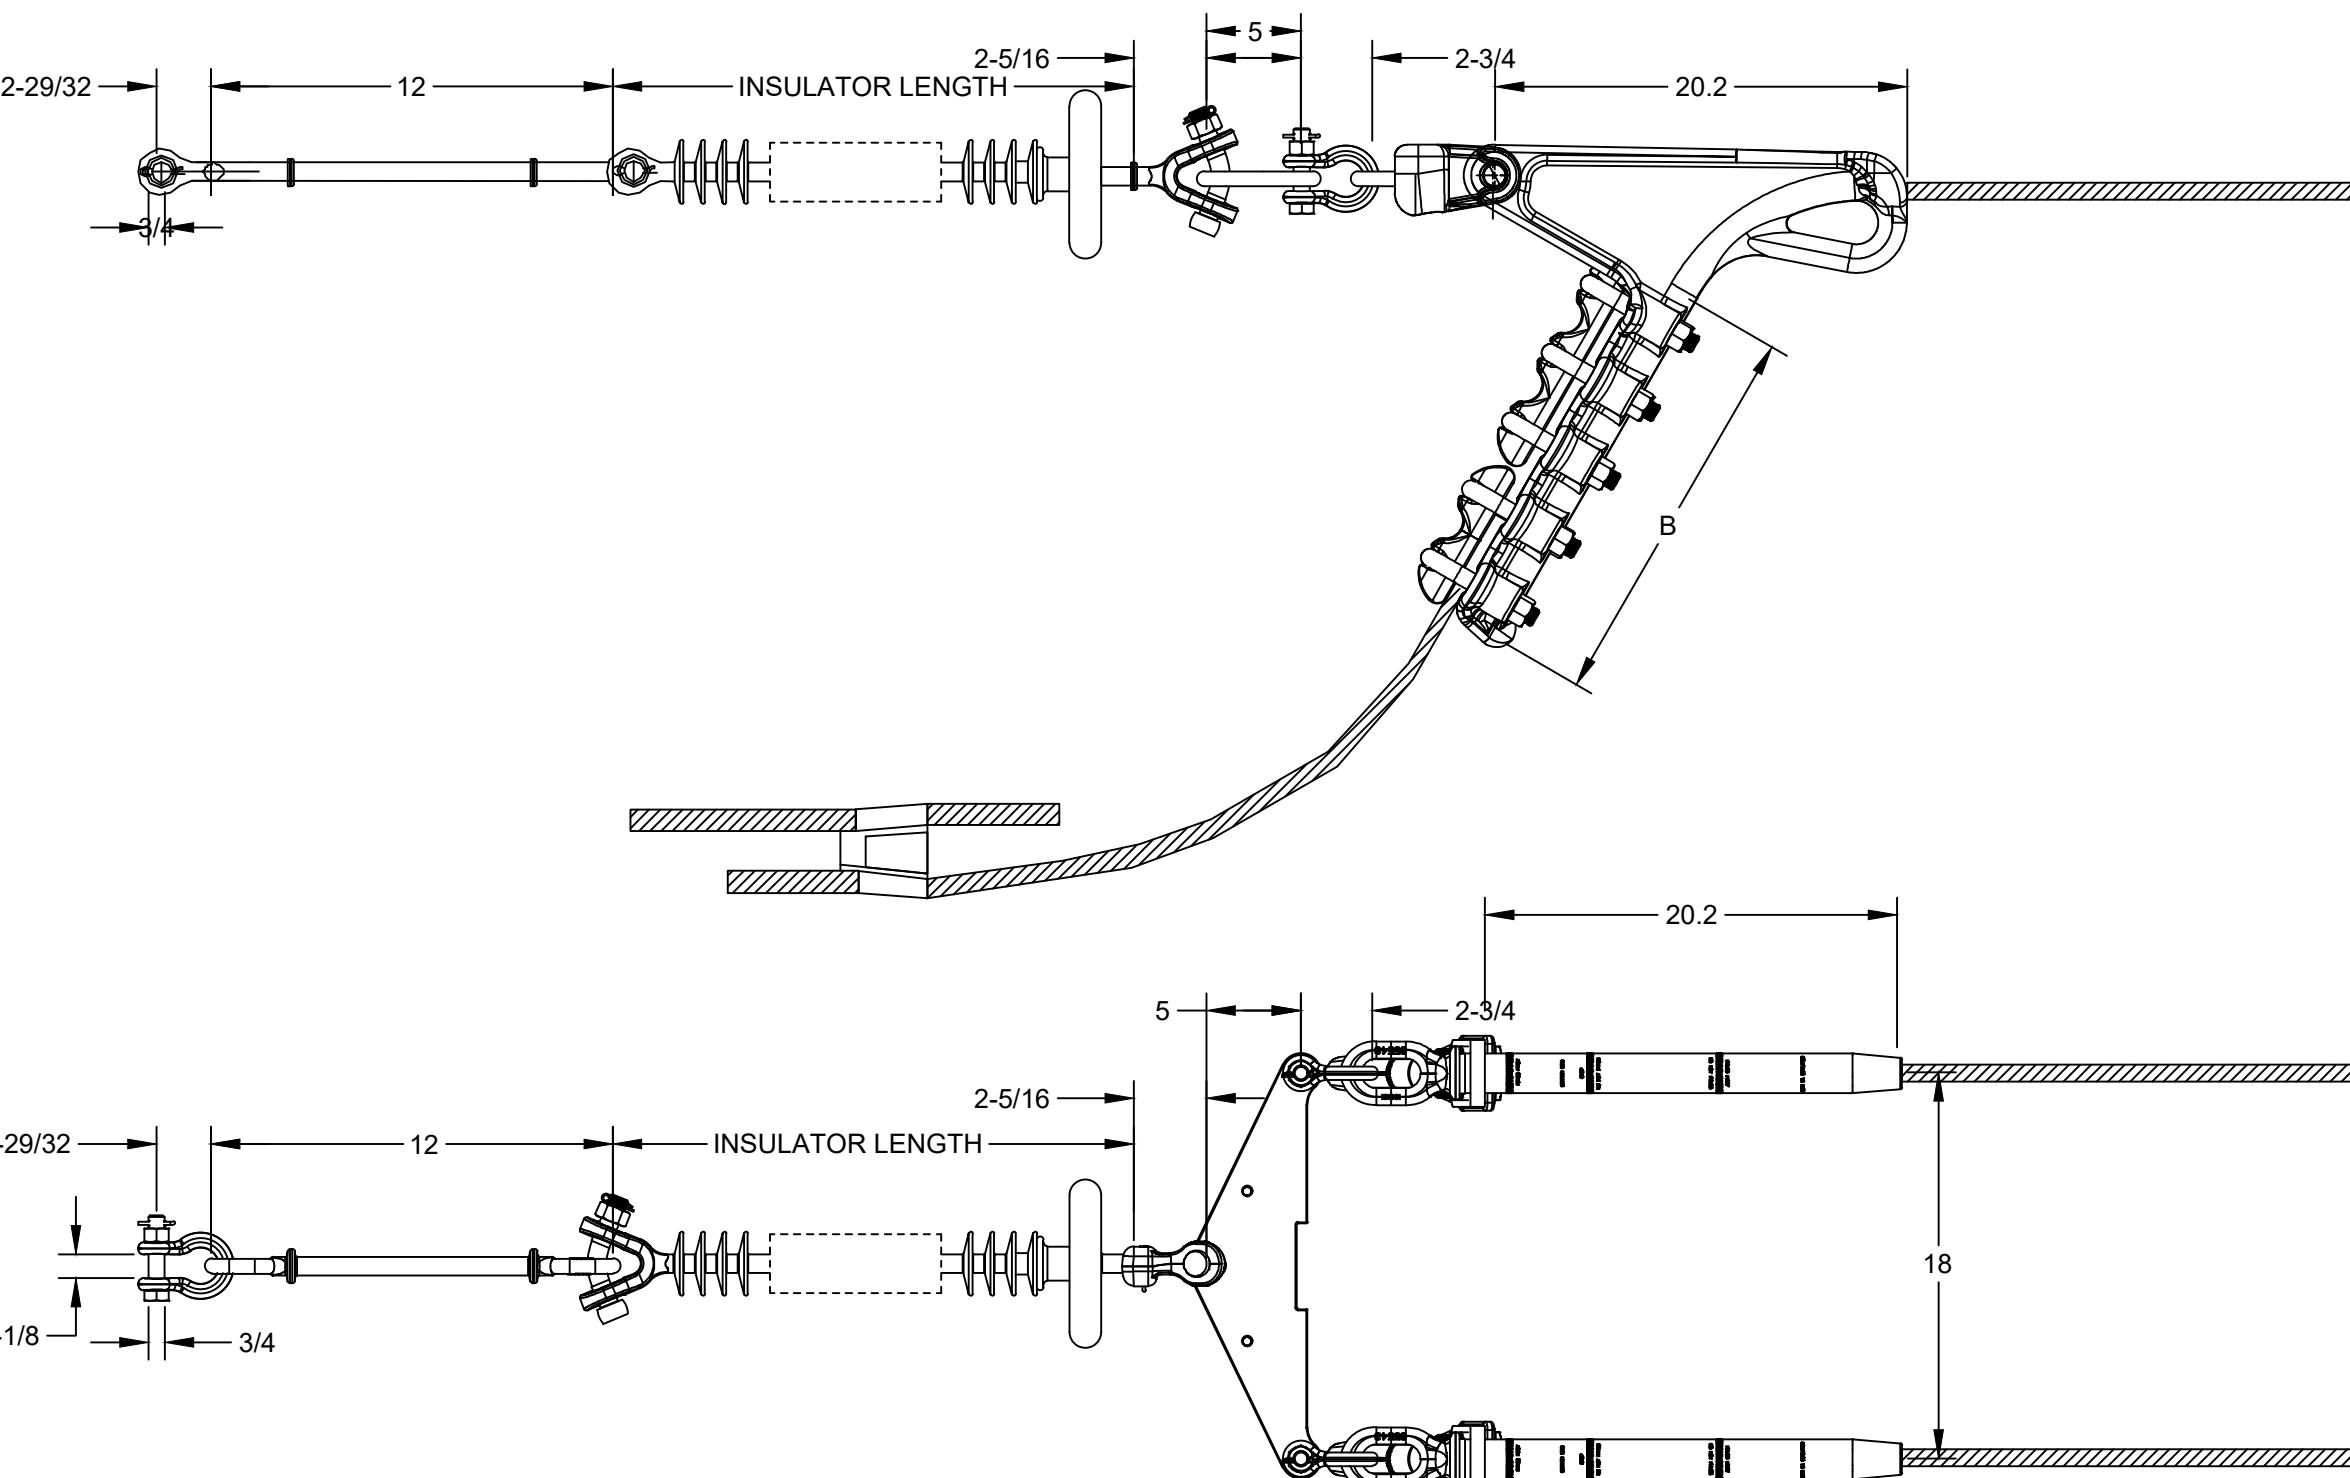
DETAIL A - OPGW DOUBLE DEADEND ASSEMBLY
